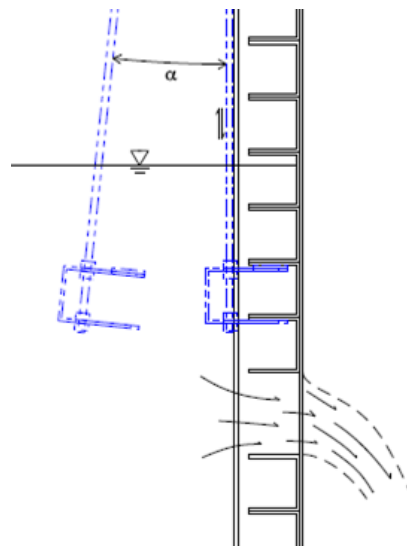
Side view - incrementally adjustable fluid control mechanism concept, employing a stack of composite c-channels and a picking mechanism.
